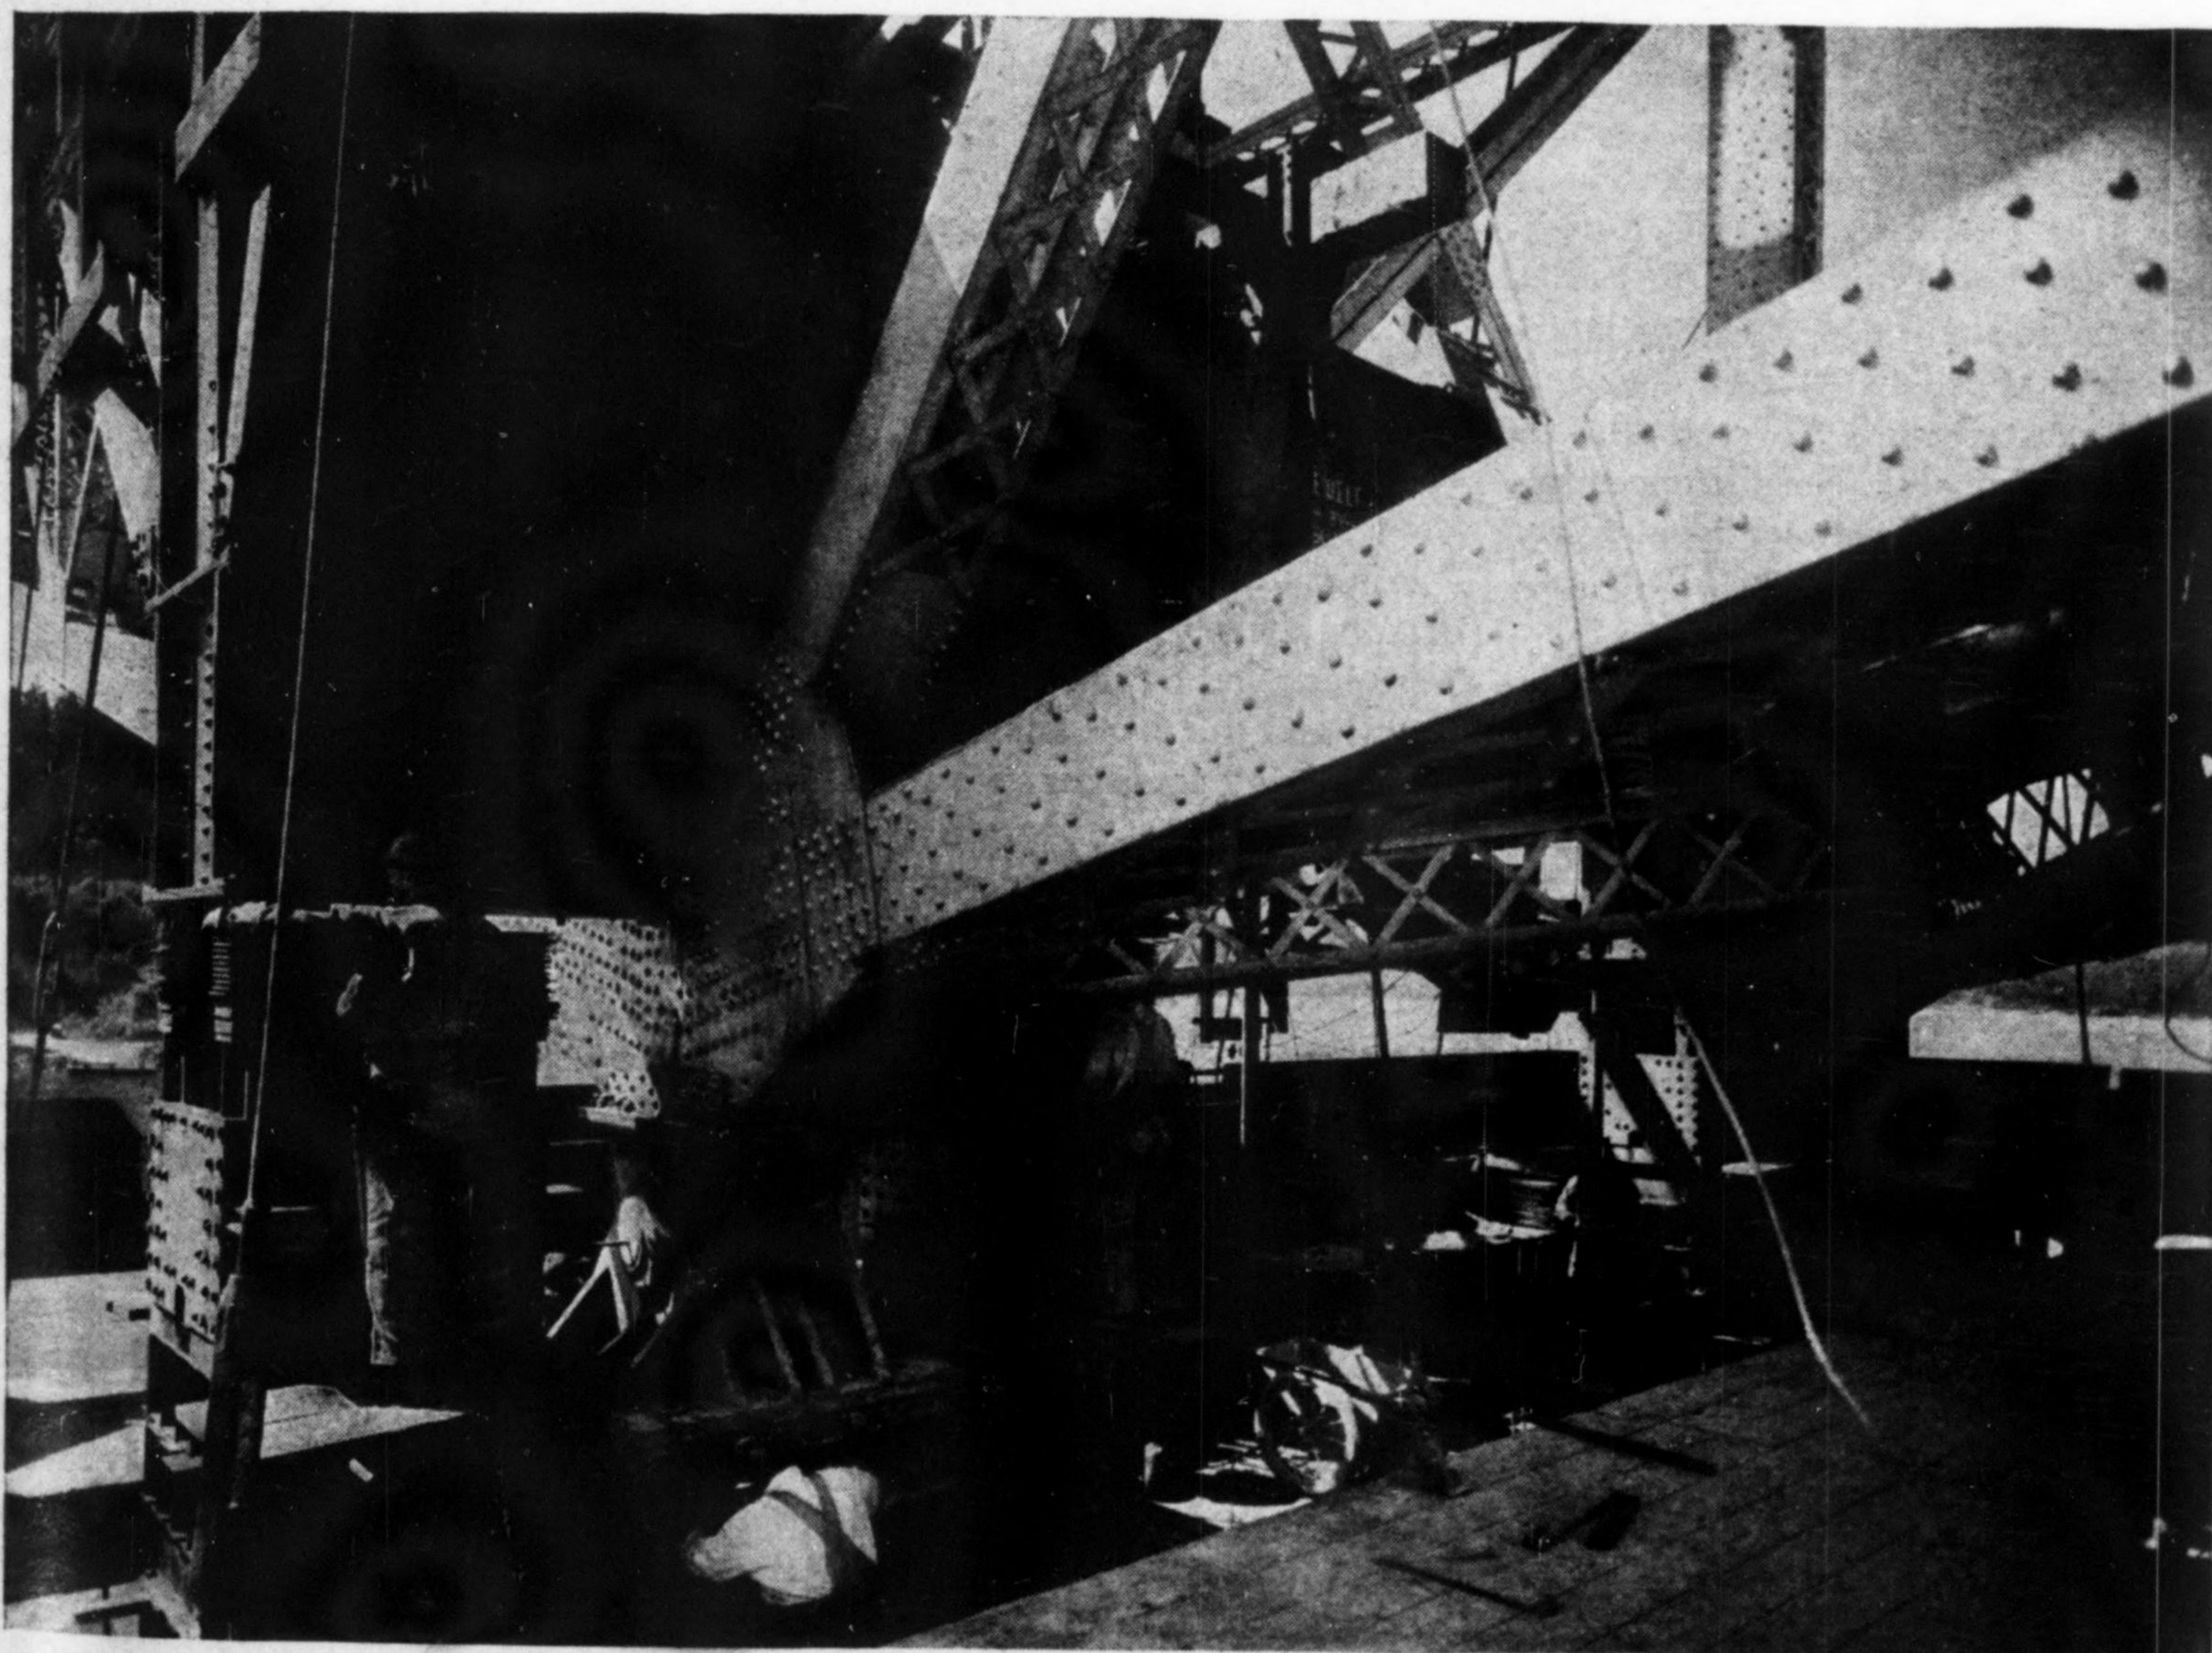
Two jacks under each end of a temporary lifting beam raised the bridge in 7-ft. lifts. The grillages under the shoes were concreted in but those under the jacks were removed prior to each pour.
